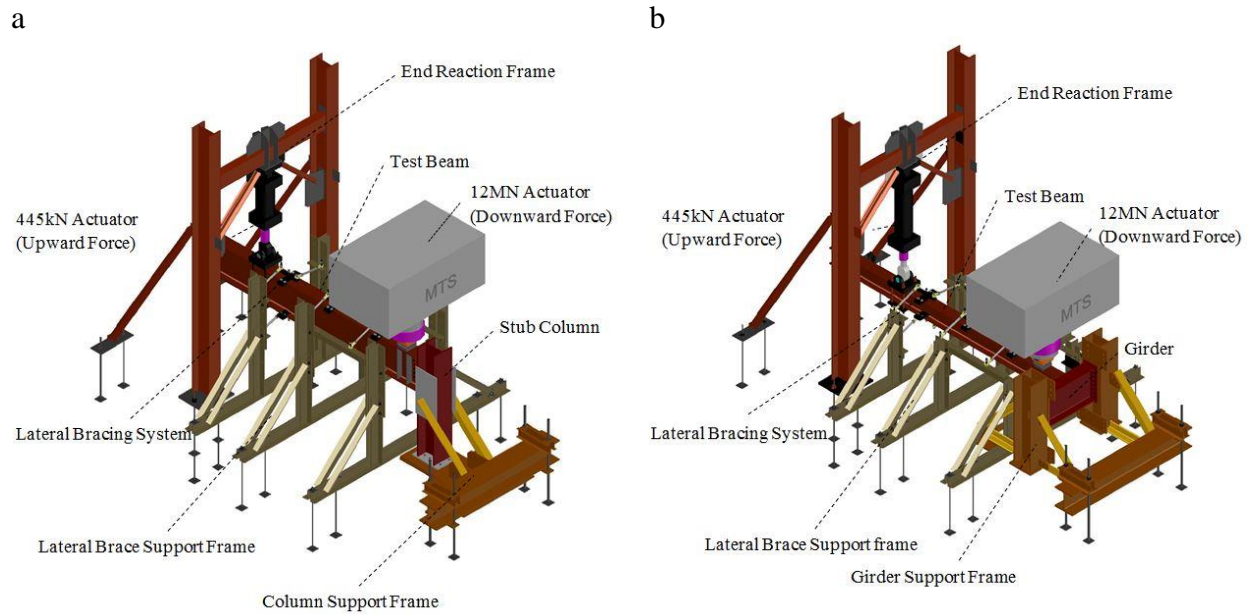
Test setup for: a) Beam-to-column shear tab, b) Beam-to-girder shear tab
